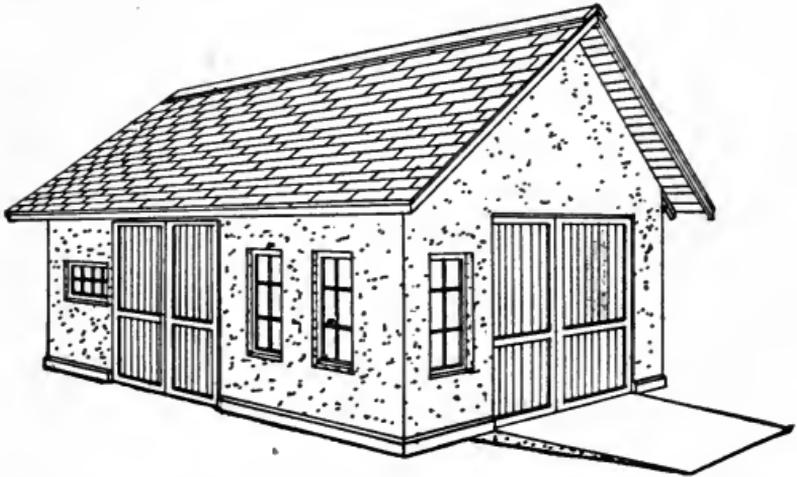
Concrete Farm Garage, Showing Both Front and Side Doors
